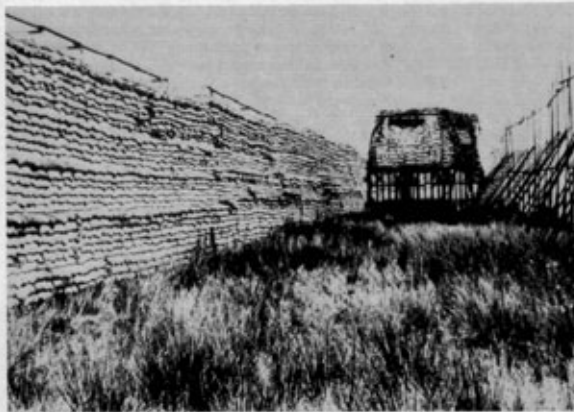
The Creggan Wall—East (outer) face. Note the difficult access and marshy ground.
